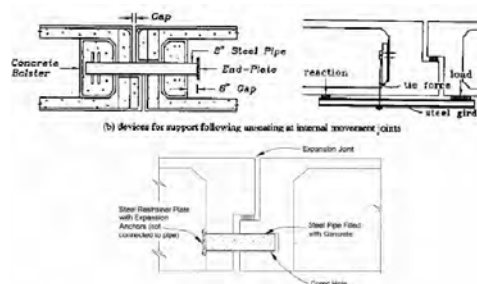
Example of a steel pipe restrainer for the girder box bridge. (FHWA 2006)
